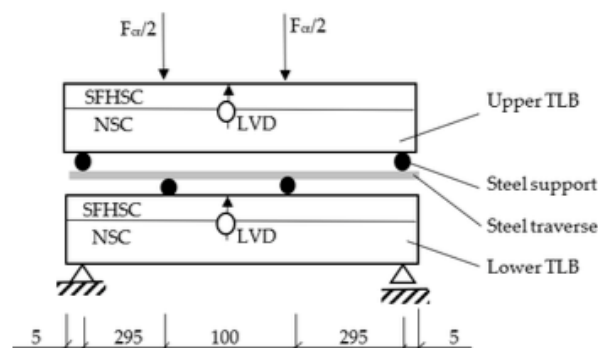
Dimensions and loading pattern of the investigated double-layer reinforced concrete beams (DLRB)
